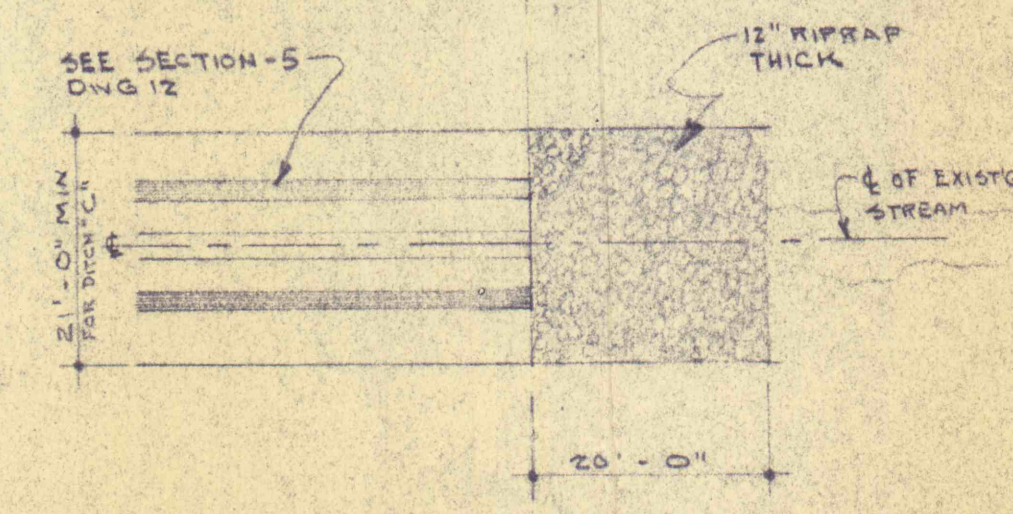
DETAIL OF CONN. DITCH "E" W/ "F" - (Q)
